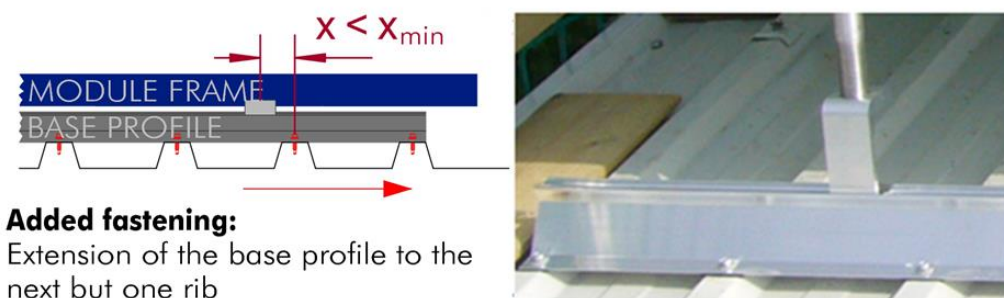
Detail on fastening the base profiles to the trapezoidal sheet – Reinforced fastening
